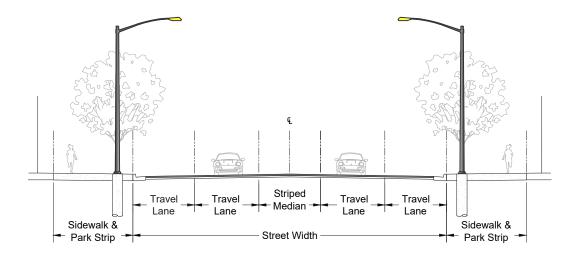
Typical Cross Section for Collector with Continuous Street Lighting
